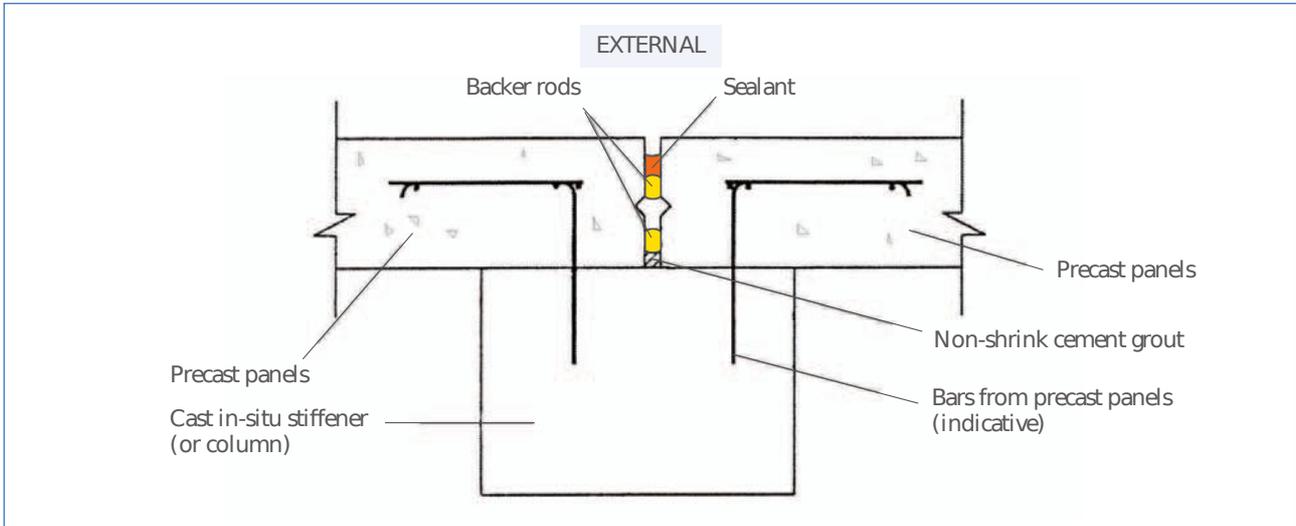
Typical details for wet joint between precast panels (plan view)
